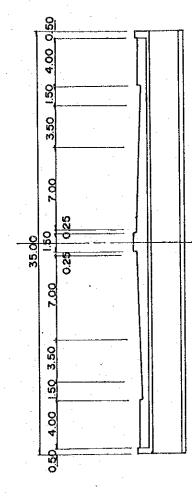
TYPICAL CROSS SECTION OF STRUCTURES - B-ROUTE, C-ROUTE AND EASTERN PART OF A-ROUTE -
